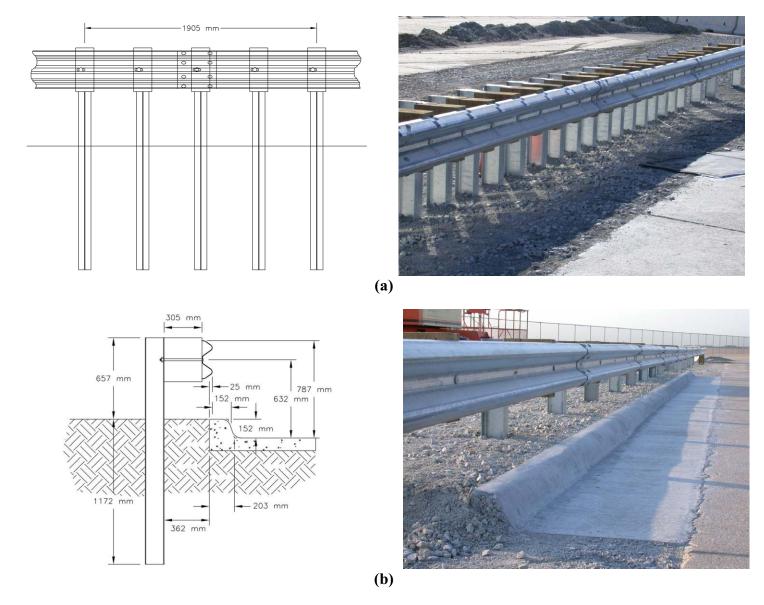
Midwest Guardrail System* for Special Applications: (a) Quarter-Post Spacing (Design B), (b) Standard Post Spacing With AASHTO Type B Curb (Design C) [1 in. = 25.4 mm].
